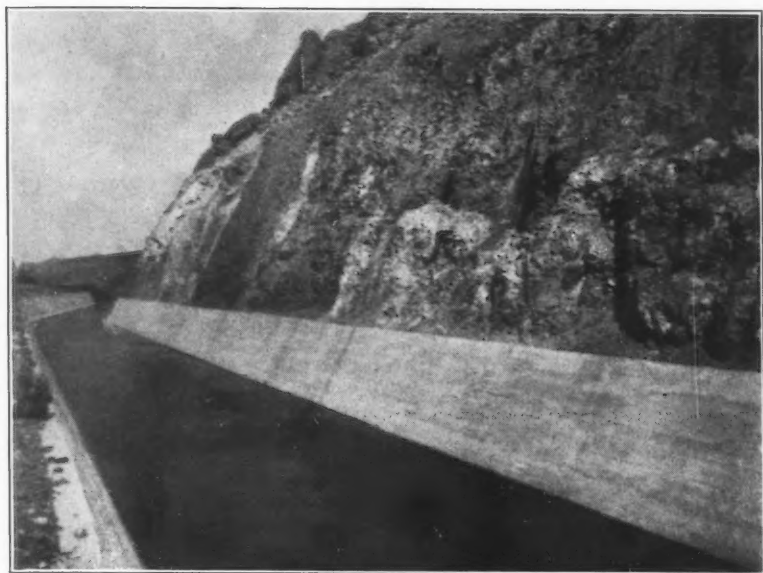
MAIN CANAL, TRUCKEE PROJECT, CONCRETE LINED.
